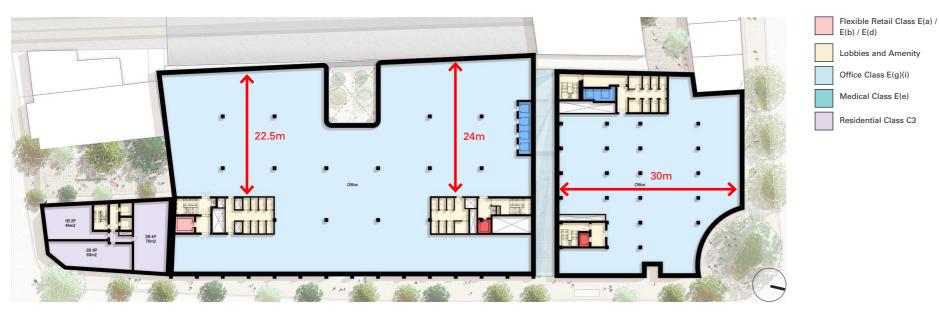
QRP 2 Illustrative Typical Floor Plan
